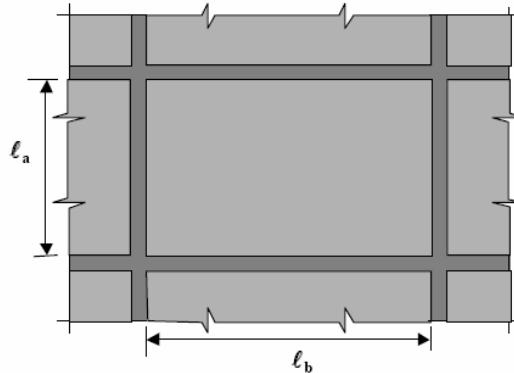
Central panel of two-way slabs supported on girders, beams or structural concrete walls
